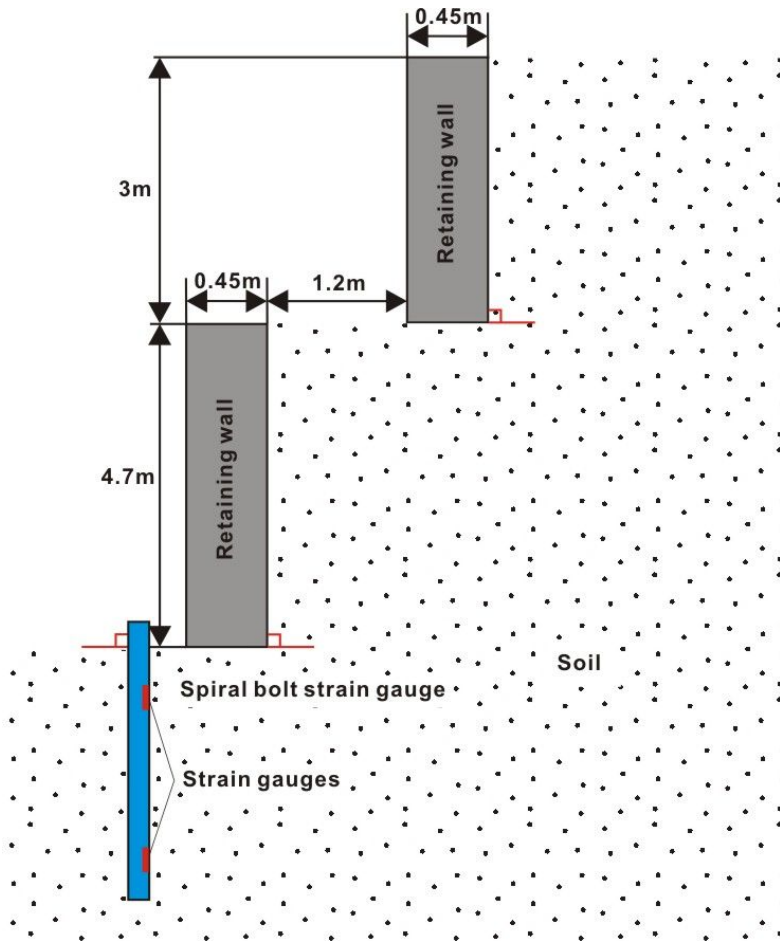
Schematic diagram of cross-section for measuring behavior of retaining wall.
